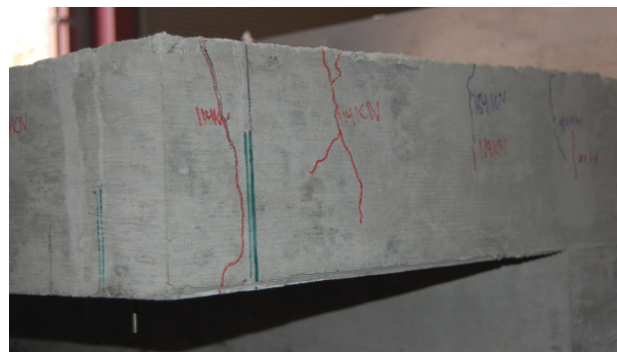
Crack marking of deck slab at 102 kN (23 kip) per jack- top view of deck
